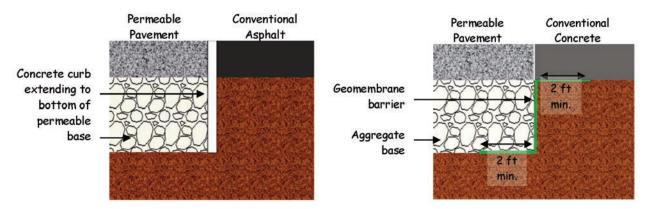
Detail of separation between permeable and conventional pavement (Source: NCDENR).
